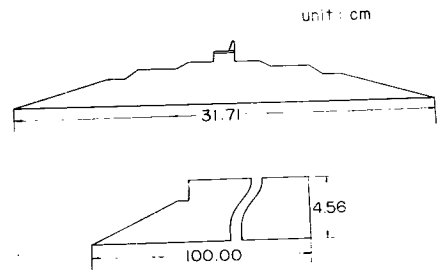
Sectional diagram of model break-water (top : cross section, bottom : longitudinal section)
